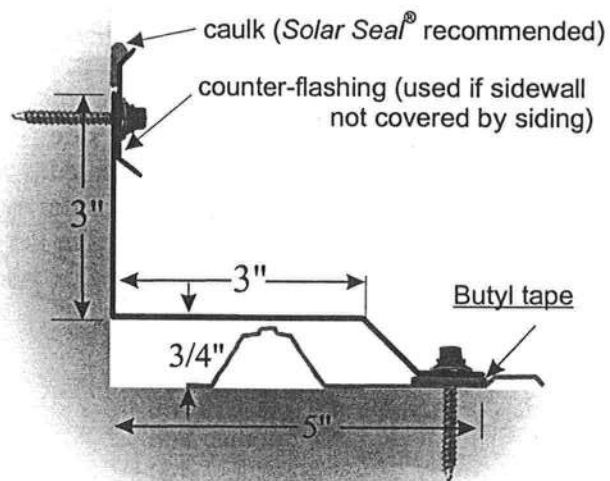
Sidewall flashing is applied when the side of the roof butts up against an adjacent wall. The wall-side of the flashing can either be covered over with siding or sealed with counterflashing. Butyl tape should be applied where the "foot" of the flashing attaches to the roof, and, if used, along the top edge of the counterflashing.
